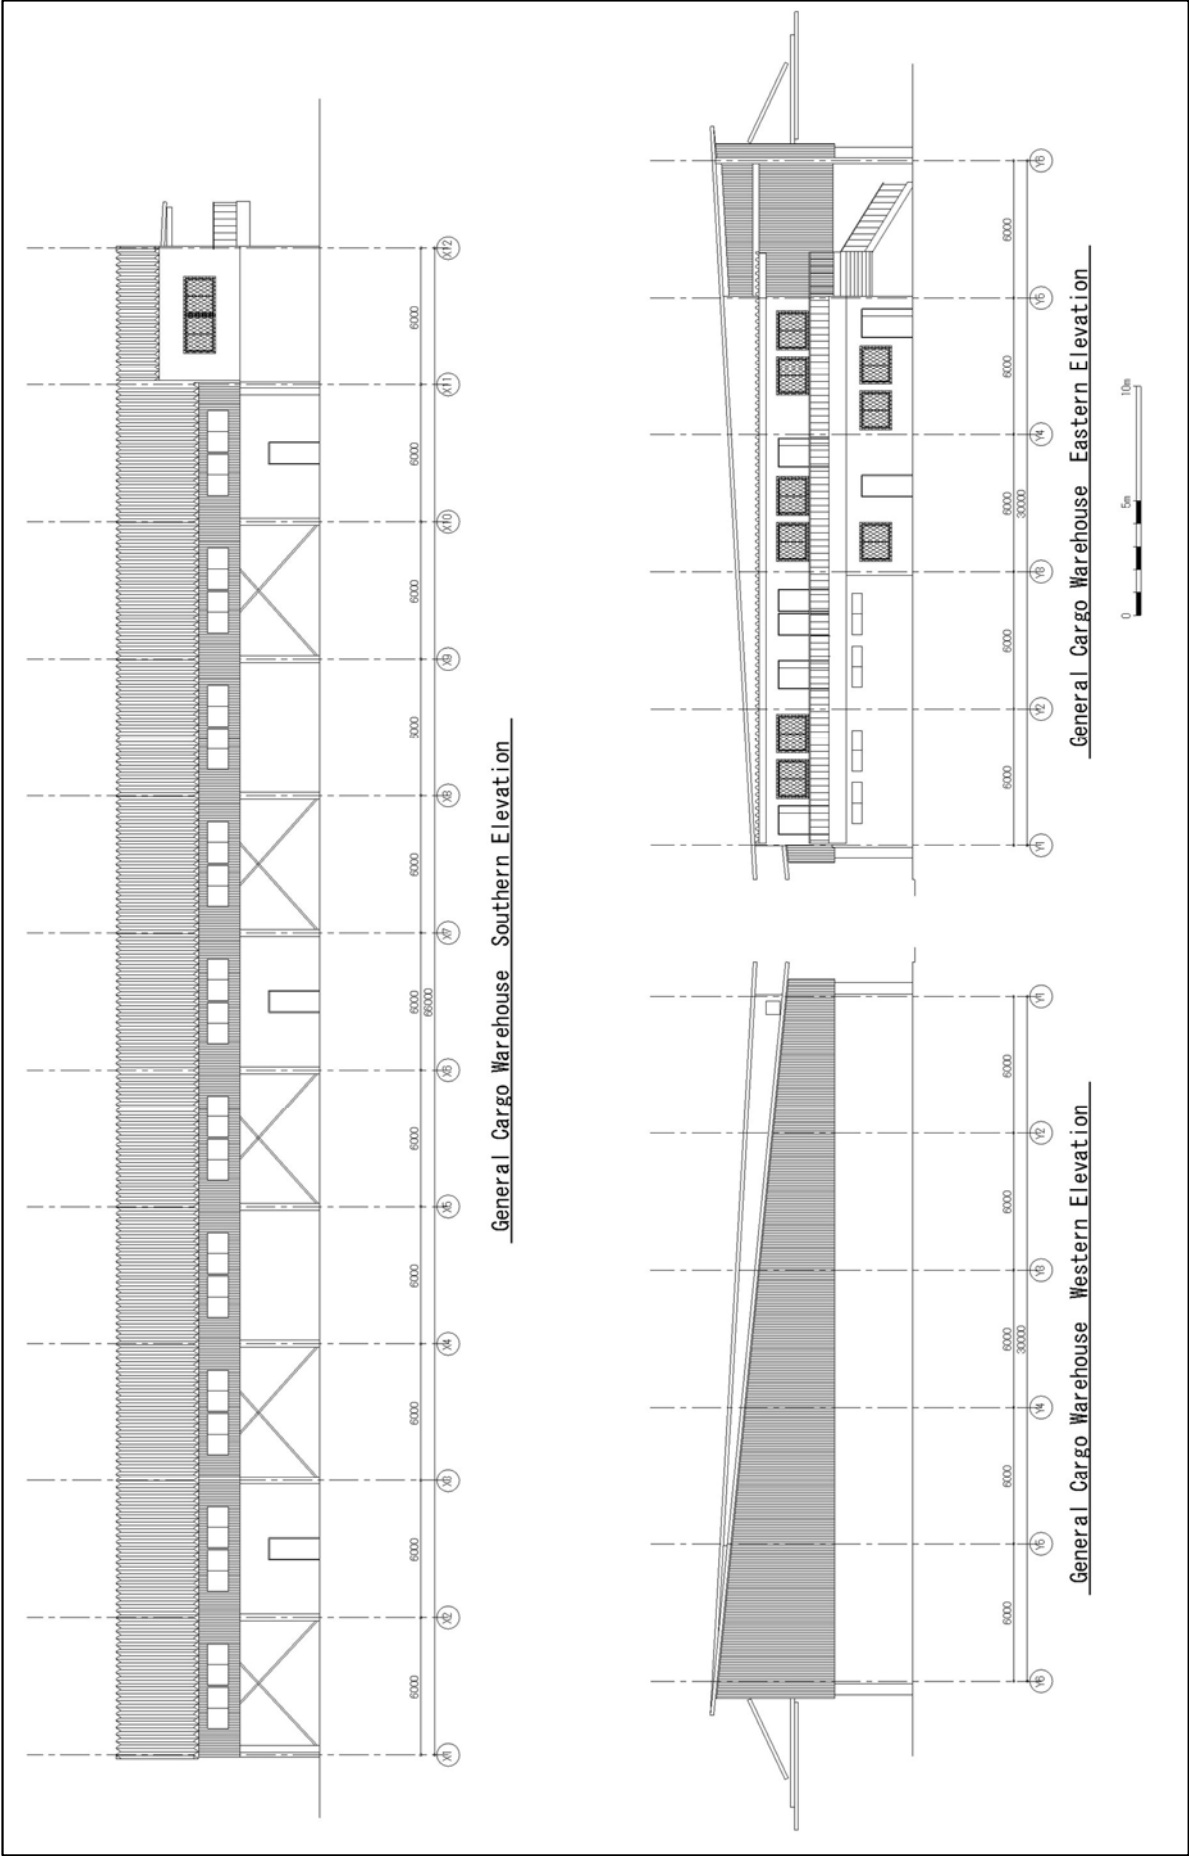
Elevation Plan of (New) General Cargo Warehouse
